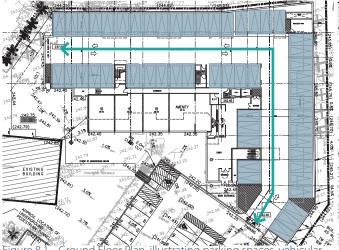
Ground Floor Plan, illustrating parking spaces, véhicular circulation and pedestrian access. Base plan by architectureunfolded
